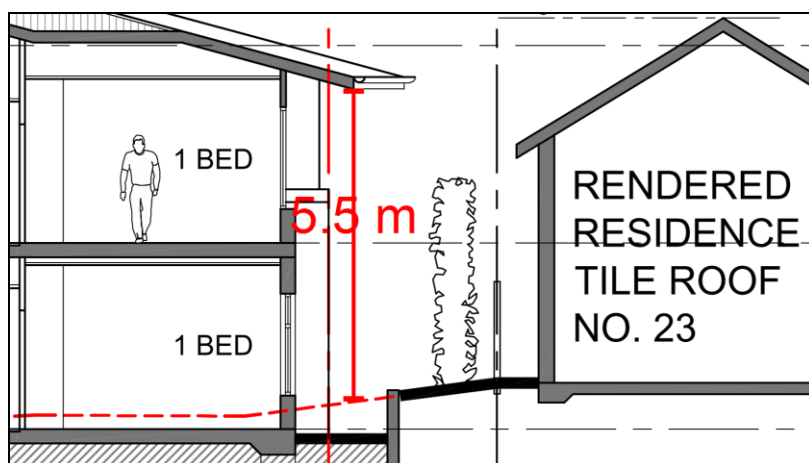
Wall height at western elevation. The red dashed line is the existing ground line.
